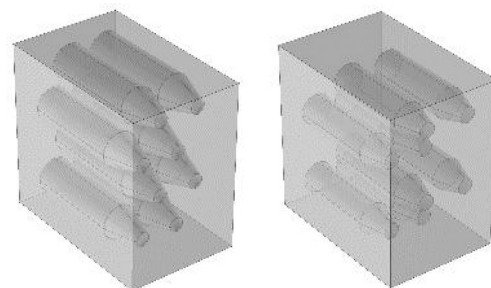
Illustration of two plastic bottle wall systems modeled in COMSOL: (a) Large bottle system; L-B wall, (b) Small bottle system; S-B wall
